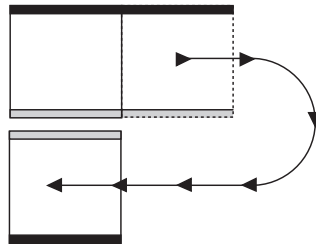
The sheet must then be rolled with a heavy roller (100 lbs.) in both directions to embed the backing in the adhesive and remove air pockets.
